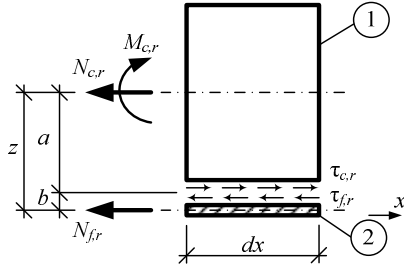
Reinforced concrete beam dx length divided into separate elements. Here 1 – reinforced concrete element; 2 – CFRP element
